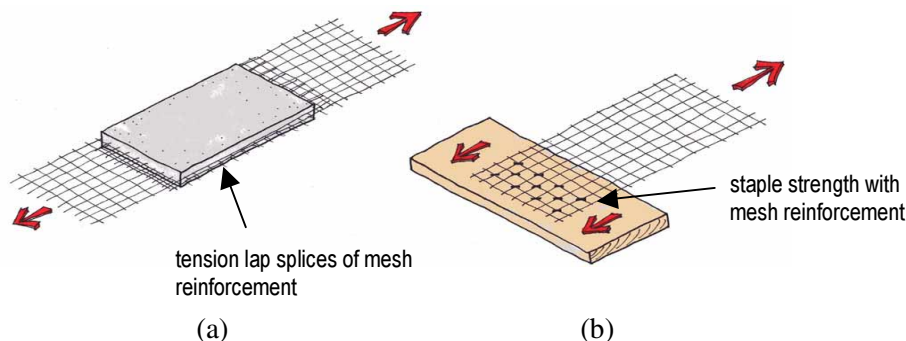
(a) Mesh lap splice tests; (b) mesh-sill plate connection tests.
